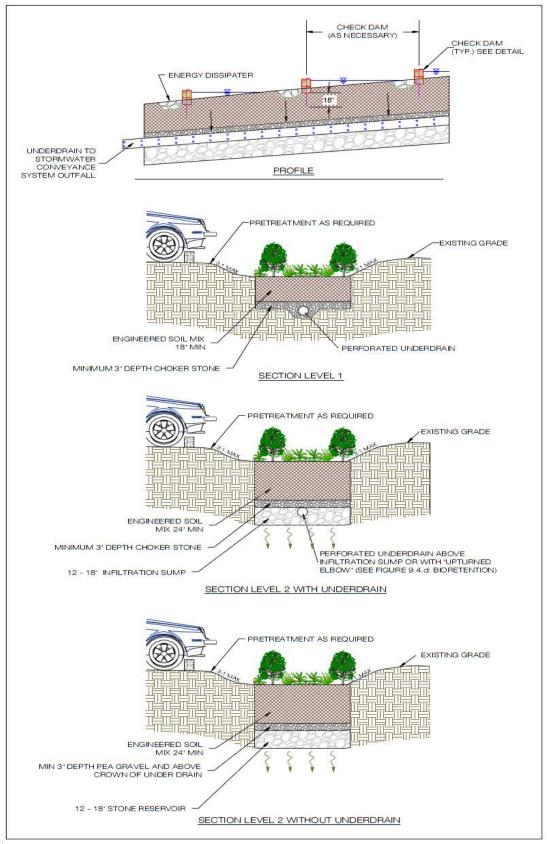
Typical Details for Level 1 and 2 Dry Swales
